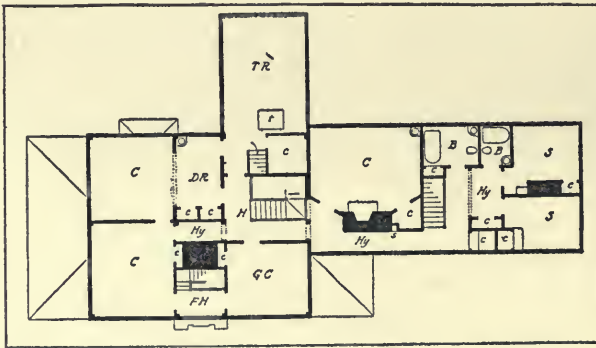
Remodeled plan—second floor. C, Chamber; G C, Guest chamber; F H, Front hall; Hy, Hallway; D R, Dressing-room; B, Bath; C, Closet; S, Servant's Room; T R, Trunk room; T, Trapdoor.
